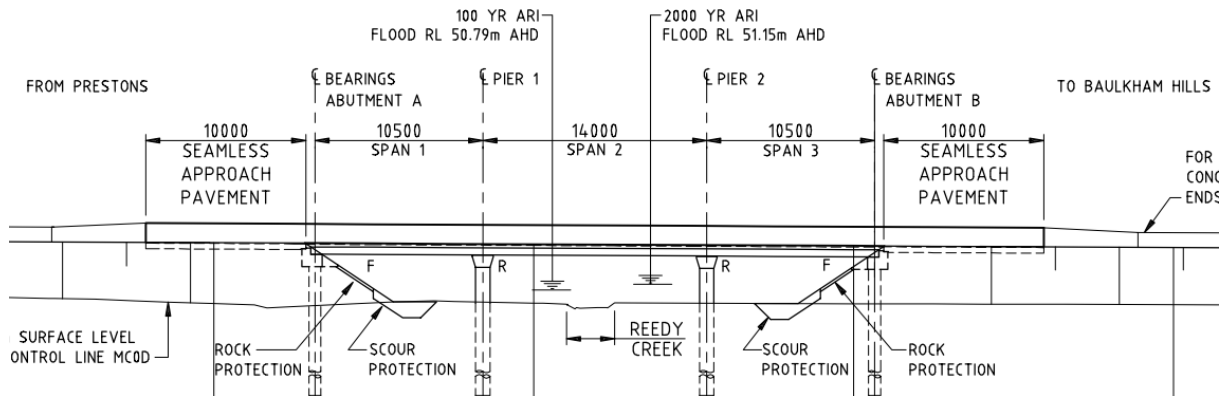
Typical Elevation – Existing Plank Bridges over Creeks/Flood Plains
